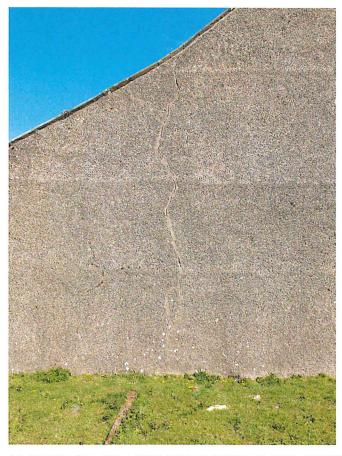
VIEW ON CRACKING TO LEFT HAND ELEVATION
